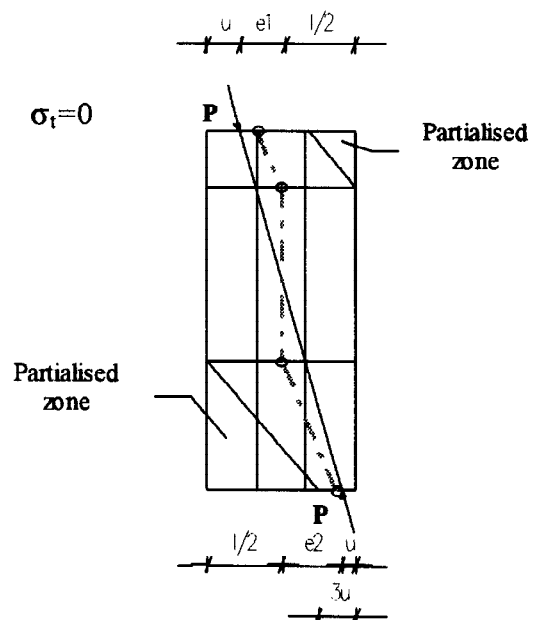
Cracking of the masonry panel due to compression and bending stress with the pressure center is external to the central core of inertia of the section.
